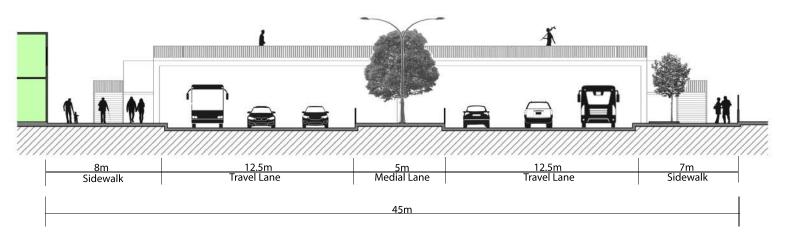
Rey Ring Road, provides a proper sidewalk and connectivity Section A-A by author
